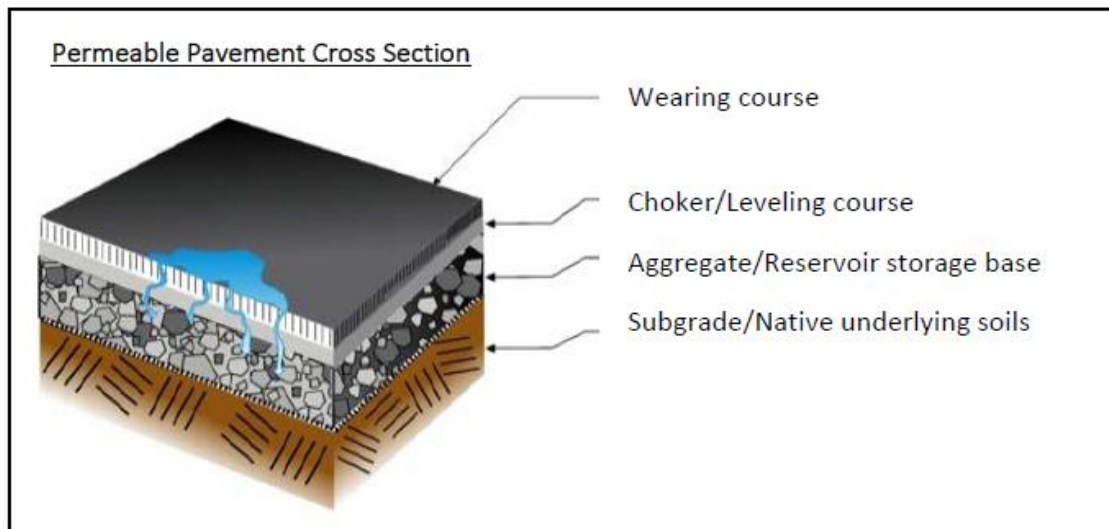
Typical layers in a permeable pavement system (Washington Stormwater Center LID Training Manual).
